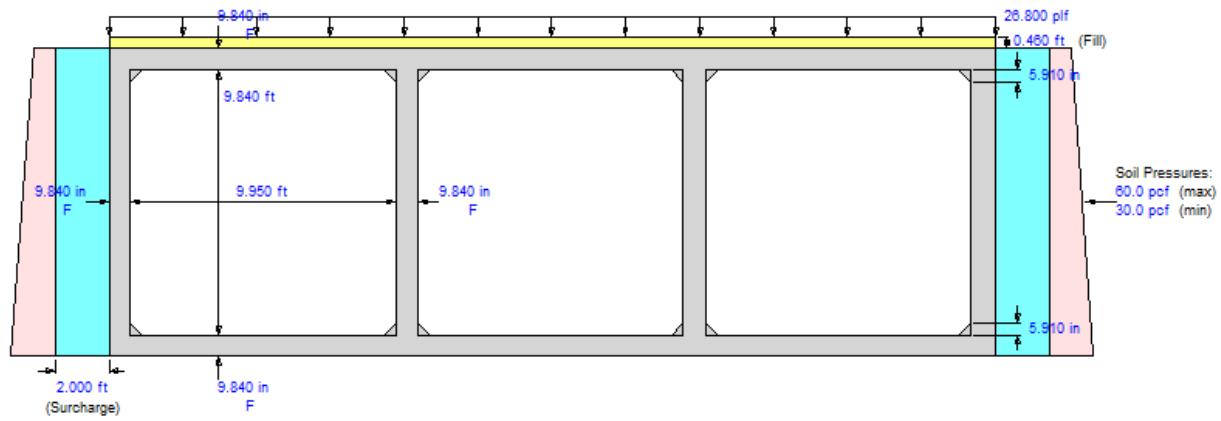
Brass Culvert 2.3.2 Bridge No. 1348 Model
